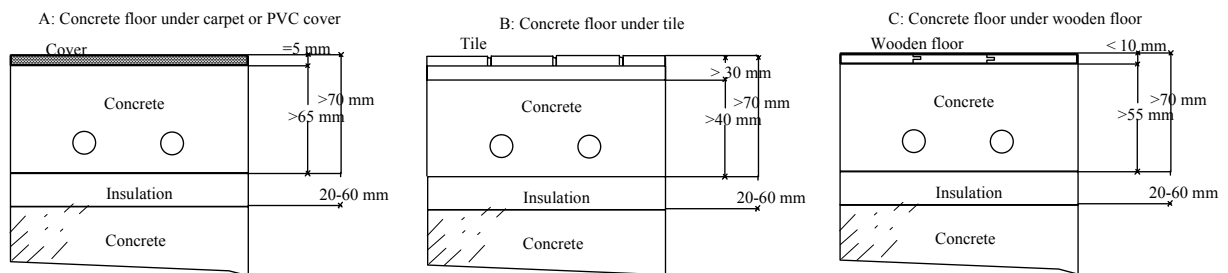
Different floor types for a Ger; *Type A*: At least 30 mm of plastic insulation is laid over the whole floor. On the insulation is laid a steel mat where PEX pipes are fastened. Then there is the concrete floor. The distance from a pipe to the surface of the floor is 30-90 mm; *Type B*: Like A, except the concrete is thinner or 30-50 mm. On top of the cover is for example 2.5 mm cork; *Type C*: Like A, except now the concrete is thinner or 30-50 mm. On top of the cover is for example 13-23 mm wooden floor
